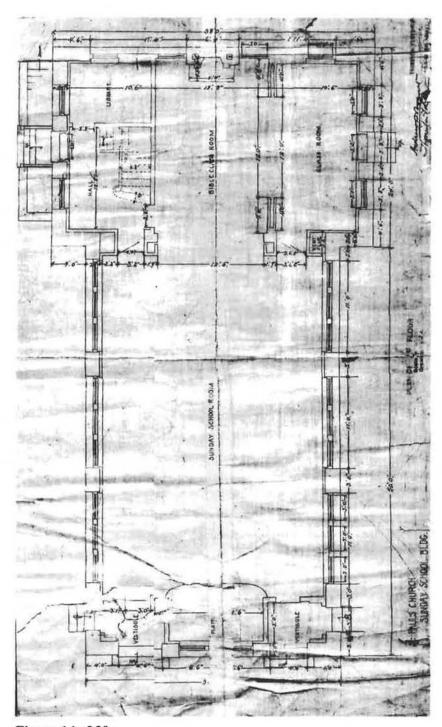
of 20: ca. 1895 Sunday School Building Plan Drawing by Thornton Floyd Turner.
